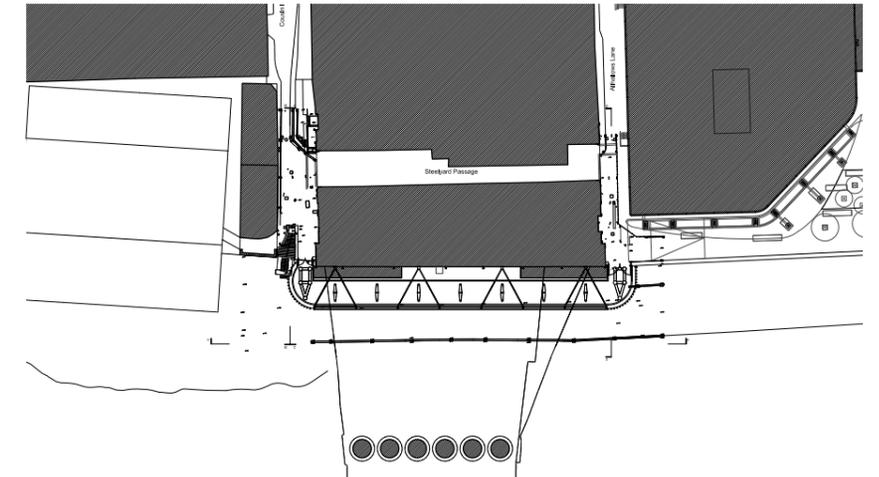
Plan of proposed walkway under Cannon Street Railway Bridge
